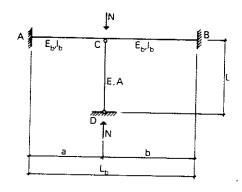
b. Fire exposed structure made up of a column CD hinged at its top end into a girder AB which is rigidly fixed at both ends
